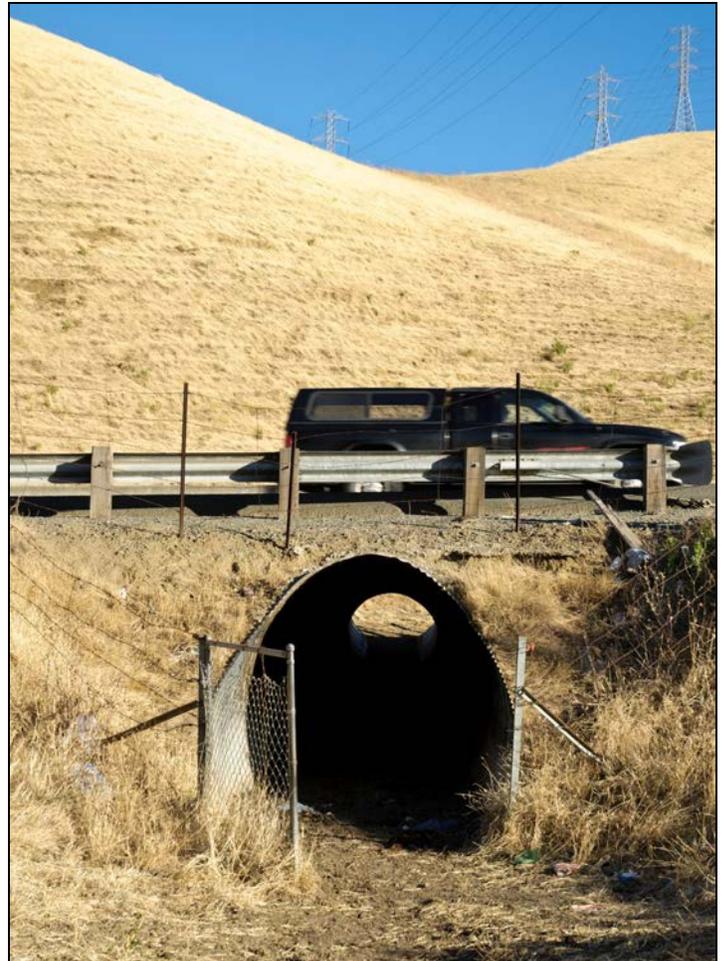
View of tunnel under Kirker Pass Road and transmission line over northern parcel
